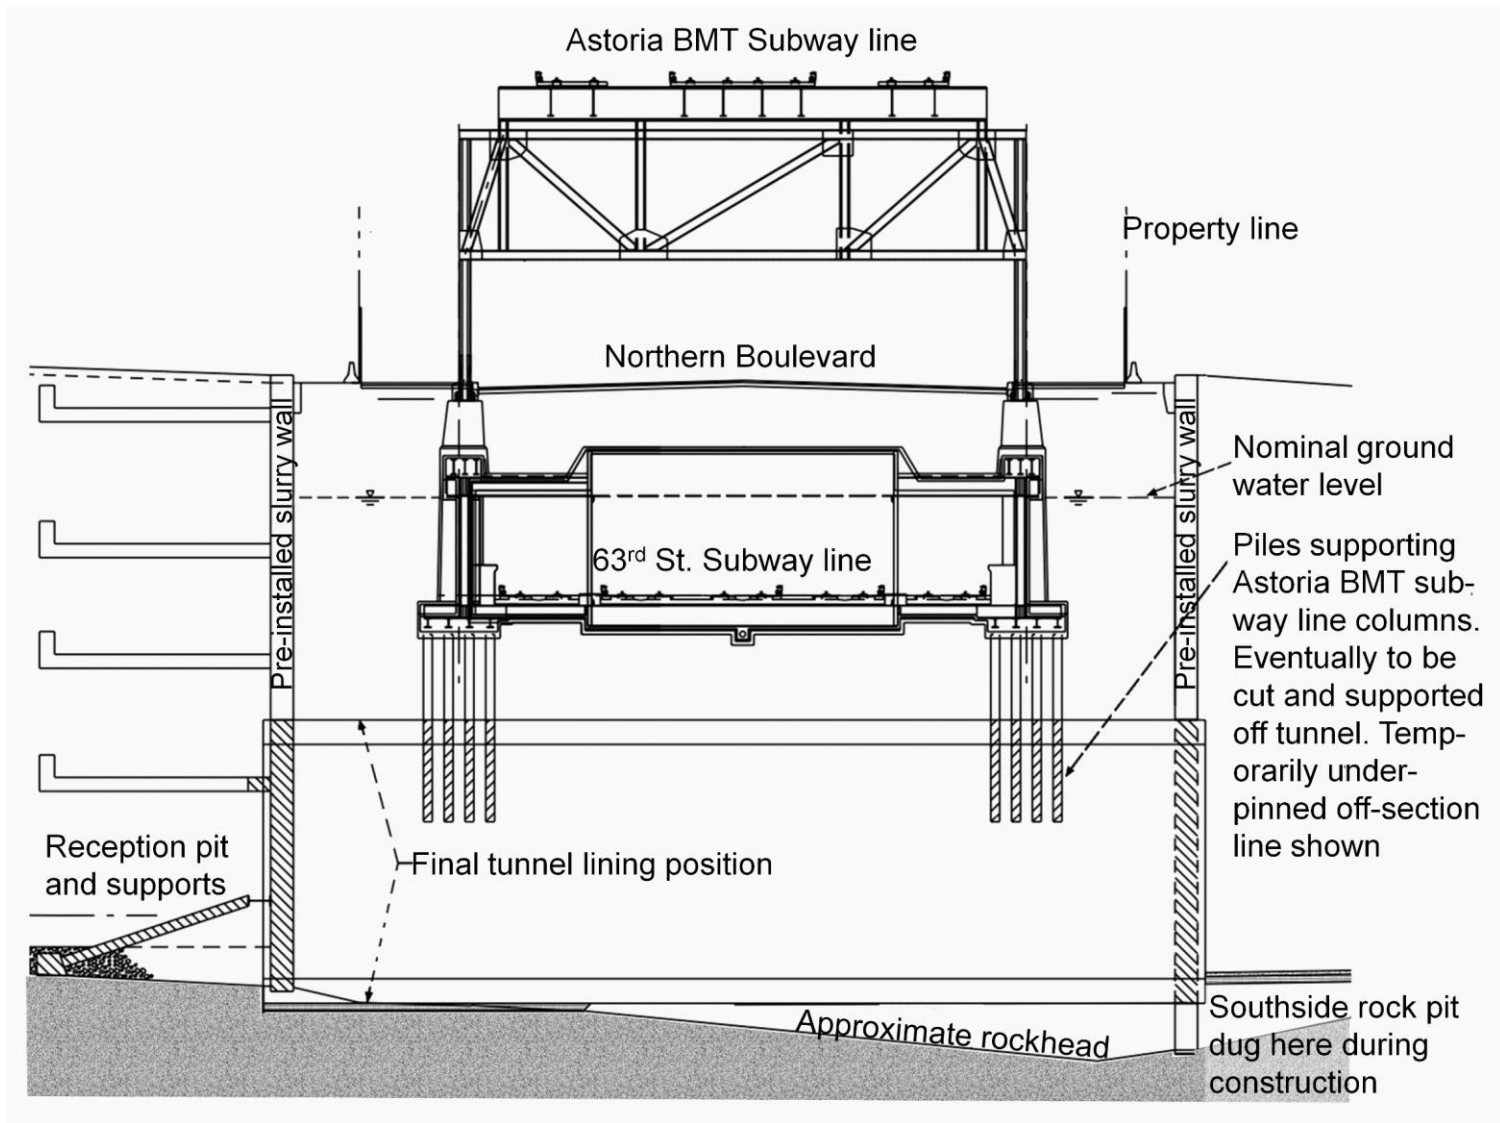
Long section of finished tunnel (adapted from Rice, 2012).
